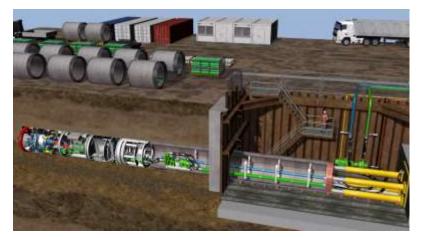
Schematic view of an AVN/slurry machine jobsite installation for Pipe Jacking
